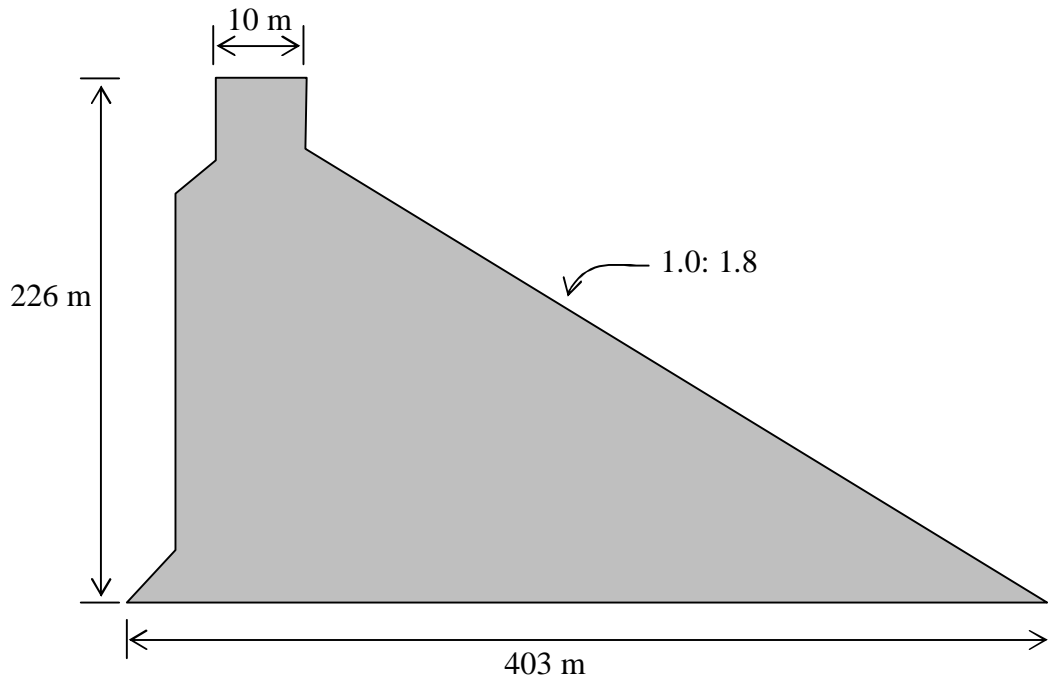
A Typical cross-section of Bhakra Dam (Garg, 2013)
